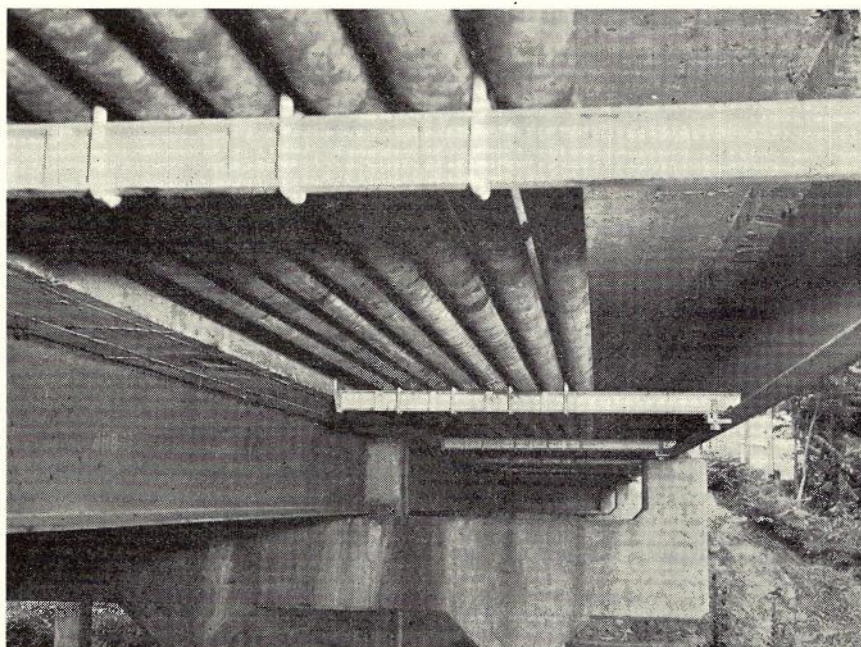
Showing pipes and bearers in position beneath footway on approach spans.
